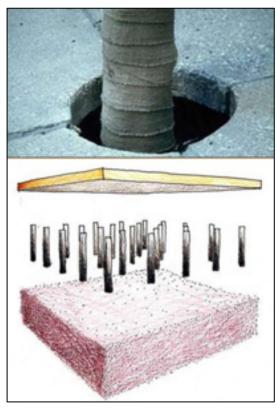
A "suspended" sidewalk is built on vertical stabilizers that provide the sidewalk with structural support while giving tree roots room to grow
